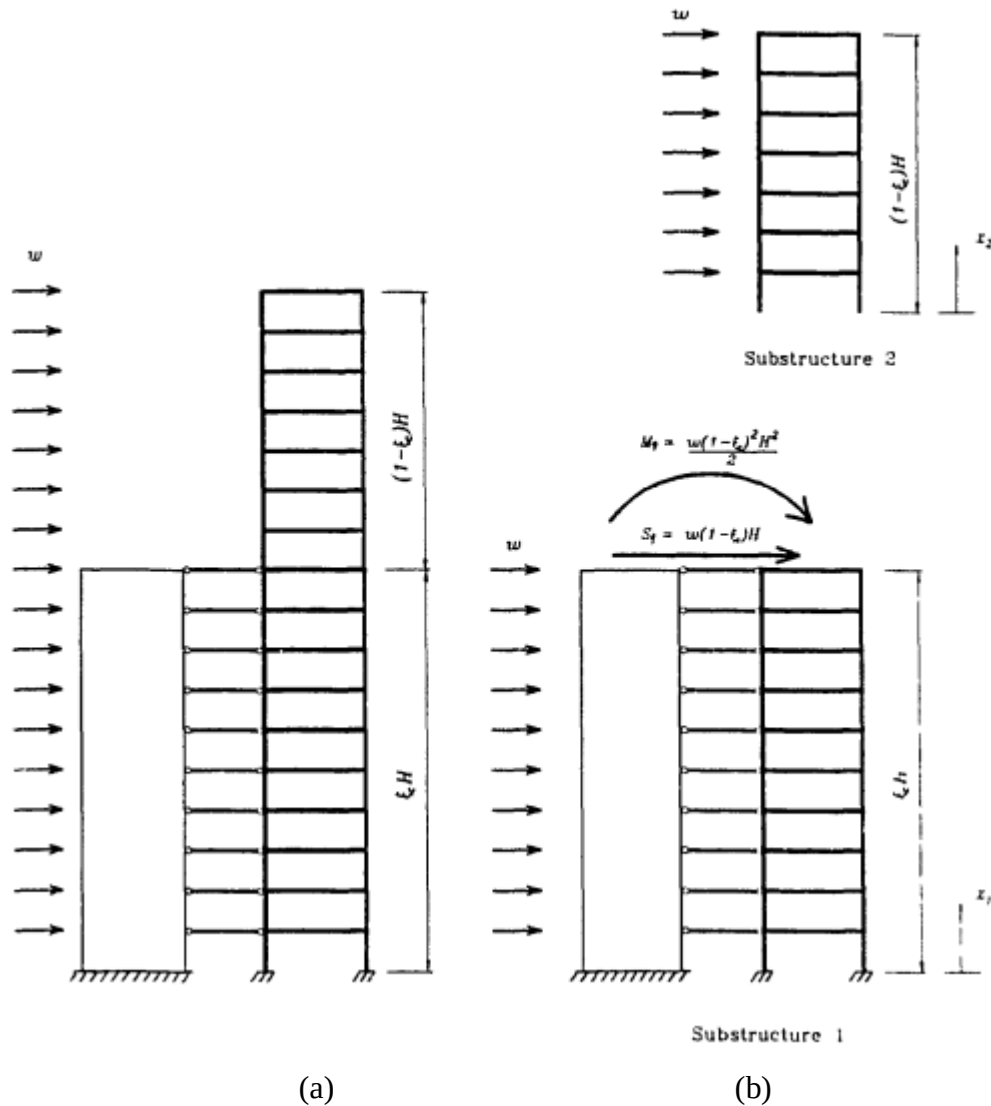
Model for Continuum Analysis: (a) Curtailed Wall-Frame Structure; and (b) Substructures of Curtailed Wall-Frame Structure
